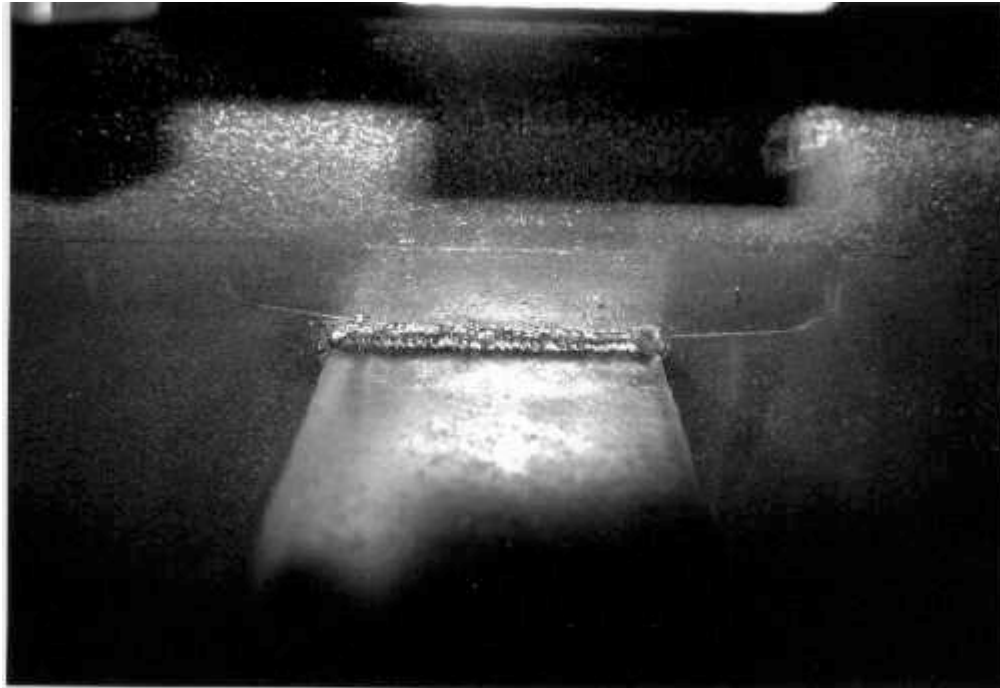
Typical horizontal beam crack located along top flange connection weld in nonstaggered diaphragm tests
